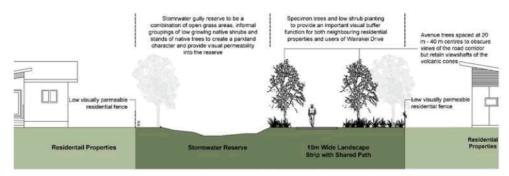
B: Cross section illustrating the Stormwater Reserve frontage
